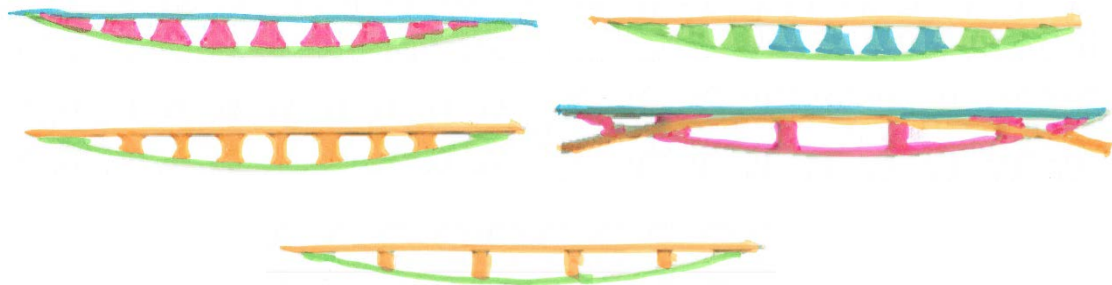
Multi material Fiber-formed truss with high performance concrete (orange), strain-hardening concrete (green), fiber reinforced concrete (blue) and self-compacting concrete (pink)
